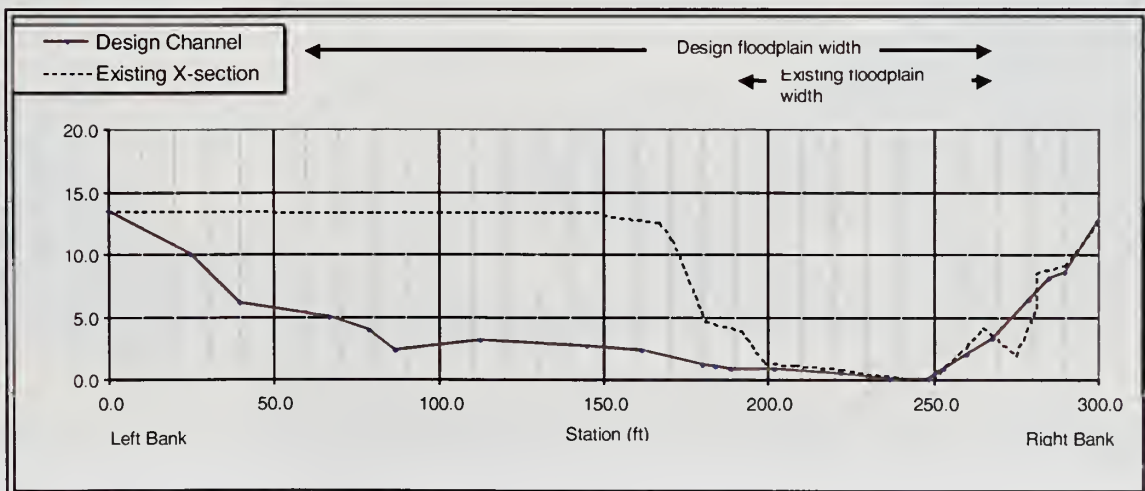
Design cross-section overlaid on existing cross-section within Birch Creek reach
